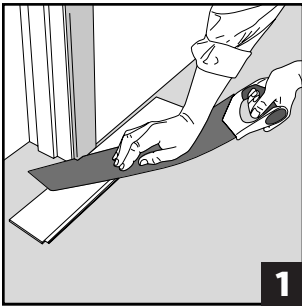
Door frames can be removed and raised, but it's usually easier to cut them. Use a loose plank as a template and saw off the excess. Ensure that the floor is not pressed between the subfloor and the door frame.
